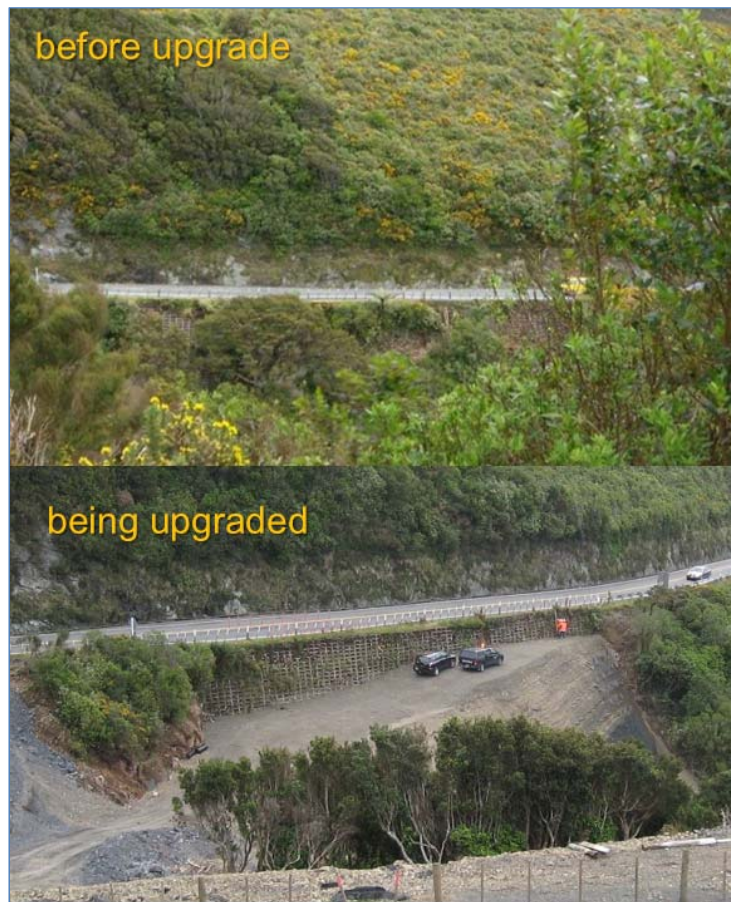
Strengthening of an Old Crib Wall with Fill Buttress and Rock Anchors
